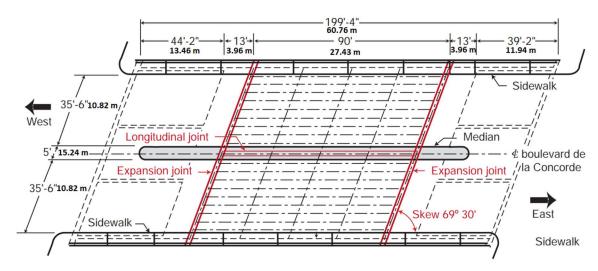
Plan View of the de la Concorde Overpass from Autoroute (Highway) 19
